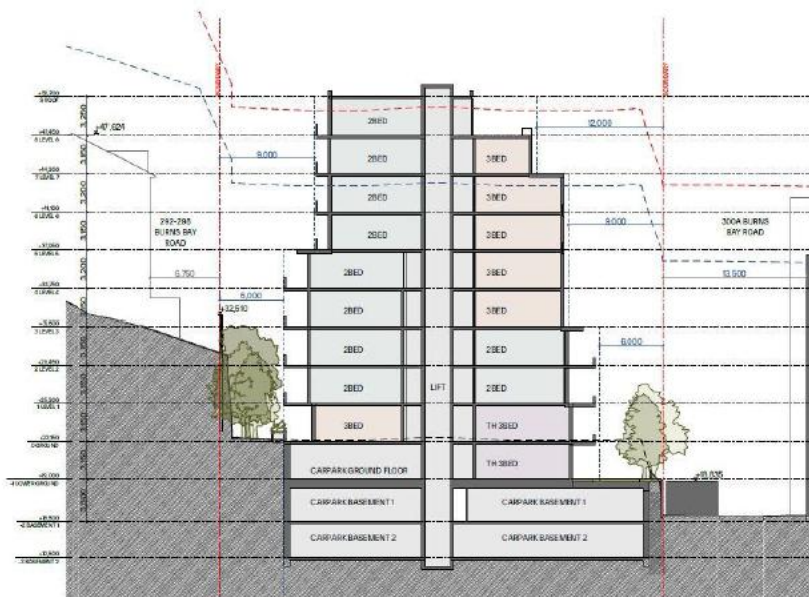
Section (from the original proposal)– Architectural plans (Source: Applicant)
